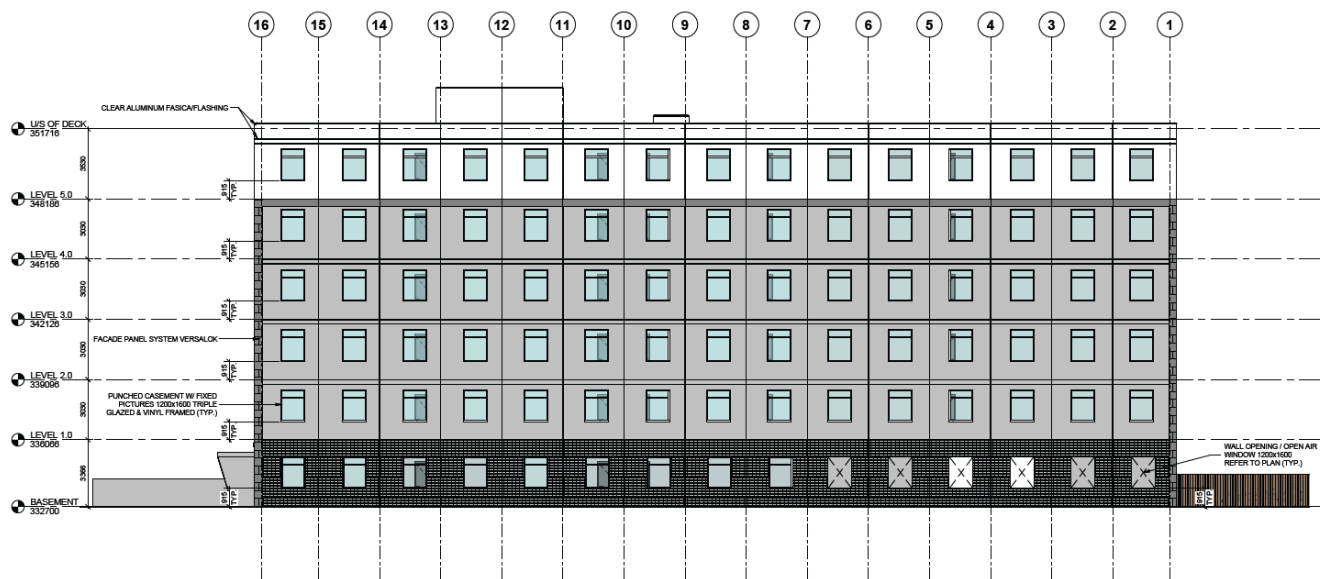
Building Elevation – North; View from Speedvale Avenue East
